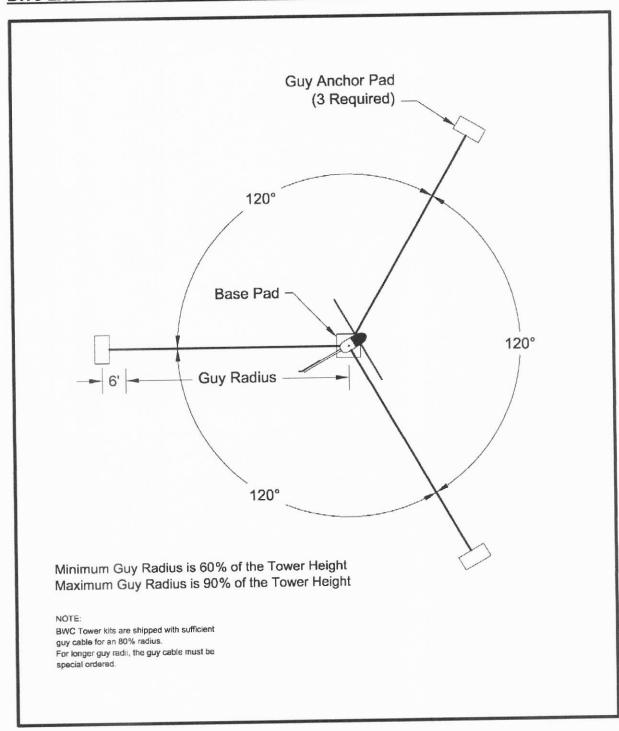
Nominal Foundation Layout for all BWC Guyed Lattice Towers
